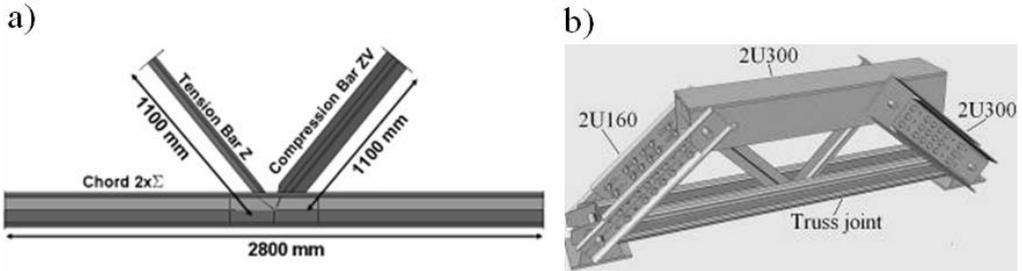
Dimensions of truss cutting containing joint (a) and frame system (b).
